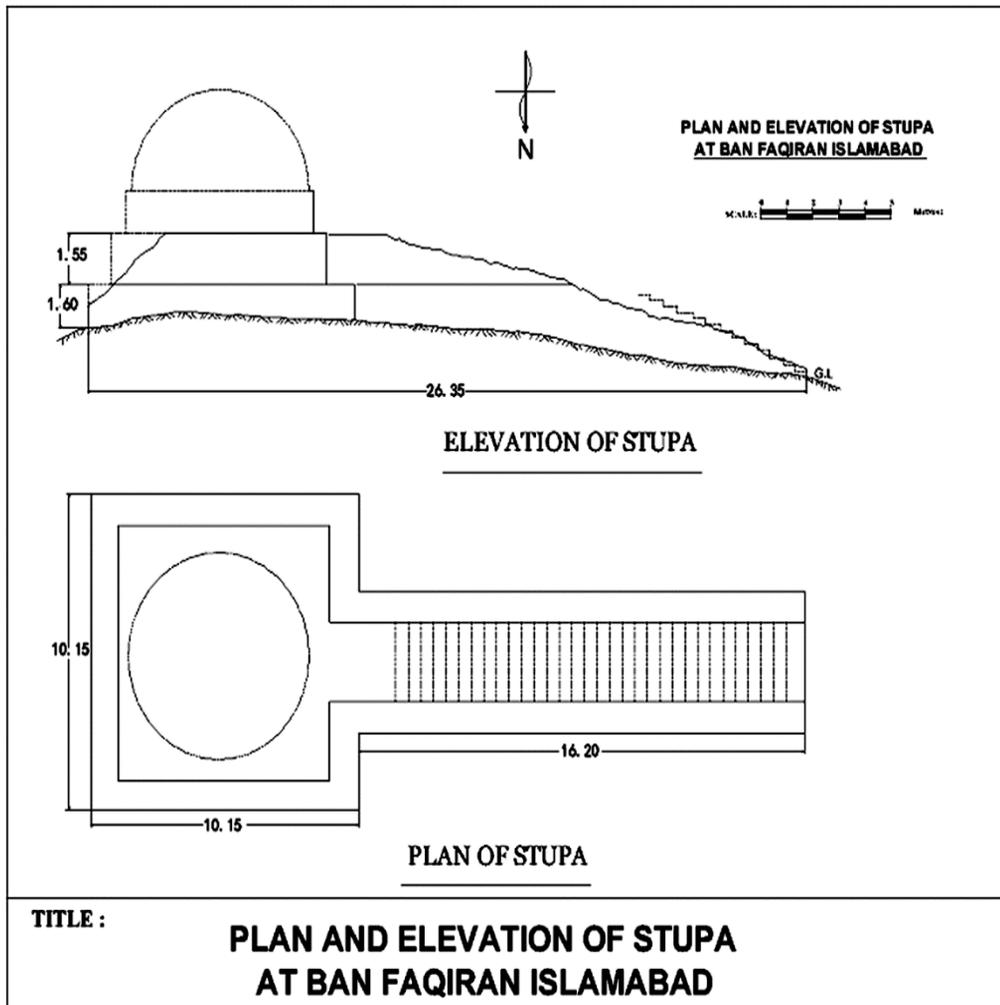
Plan and Elevation of Stupa at Ban Faqiran, Islamabad
